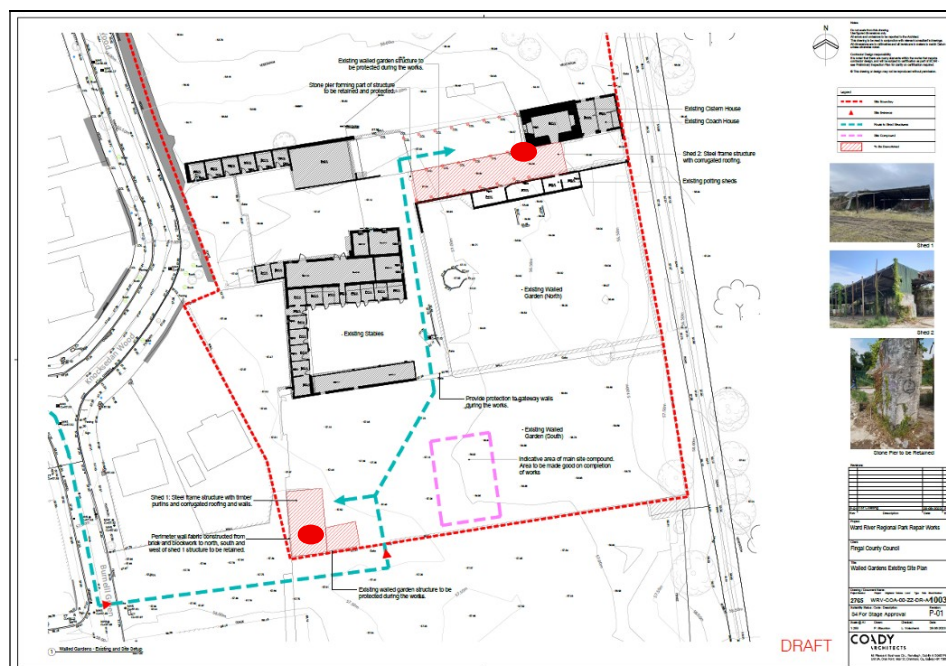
Locations of SM2 bat detectors beside the Cistern House and in the south west corner of the southern walled garden in June and August 2024.
